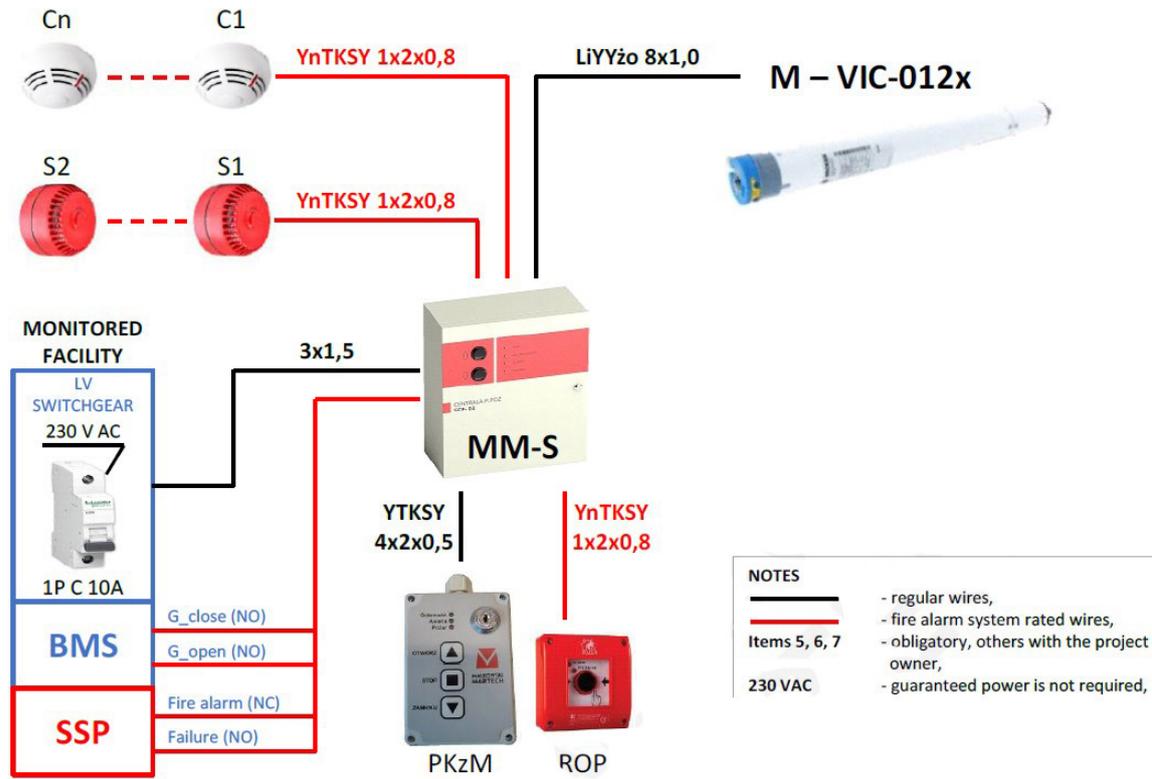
control system with internally-mounted 230 V AC drive unit (gravity closing)
